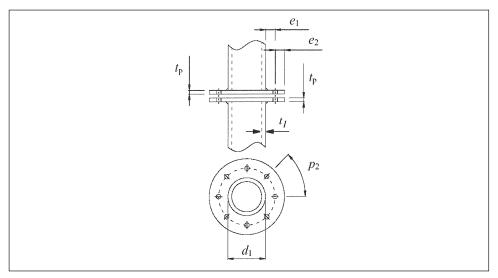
End-to-end joint with flange-plates, when having circular hollow sections
